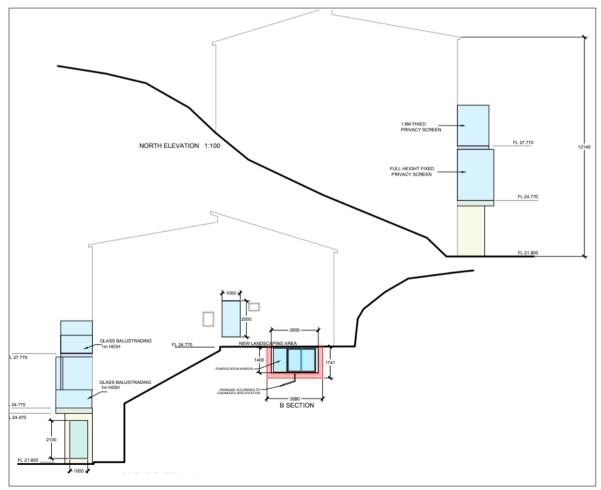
Elevation Plan - Works are wholly within existing building (Council Approval Design)
